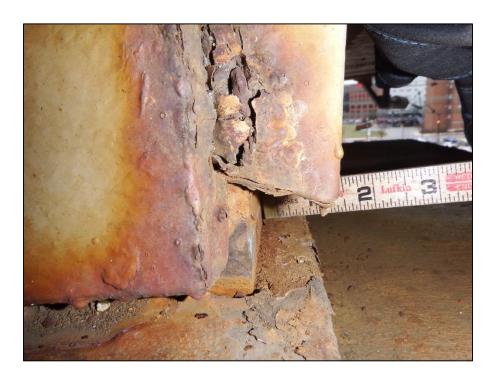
Corroded and fully contracted bearing (Span 2, Bearing 1 at Pier 2)
